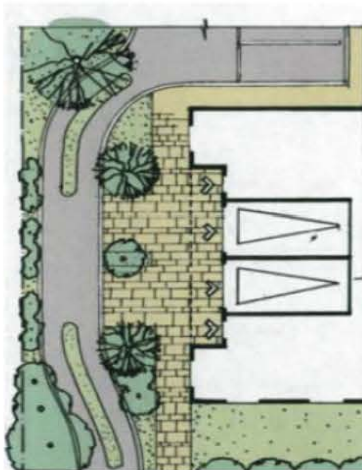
Curved pavement and landscape planting to reduce visual impact of driveway.
